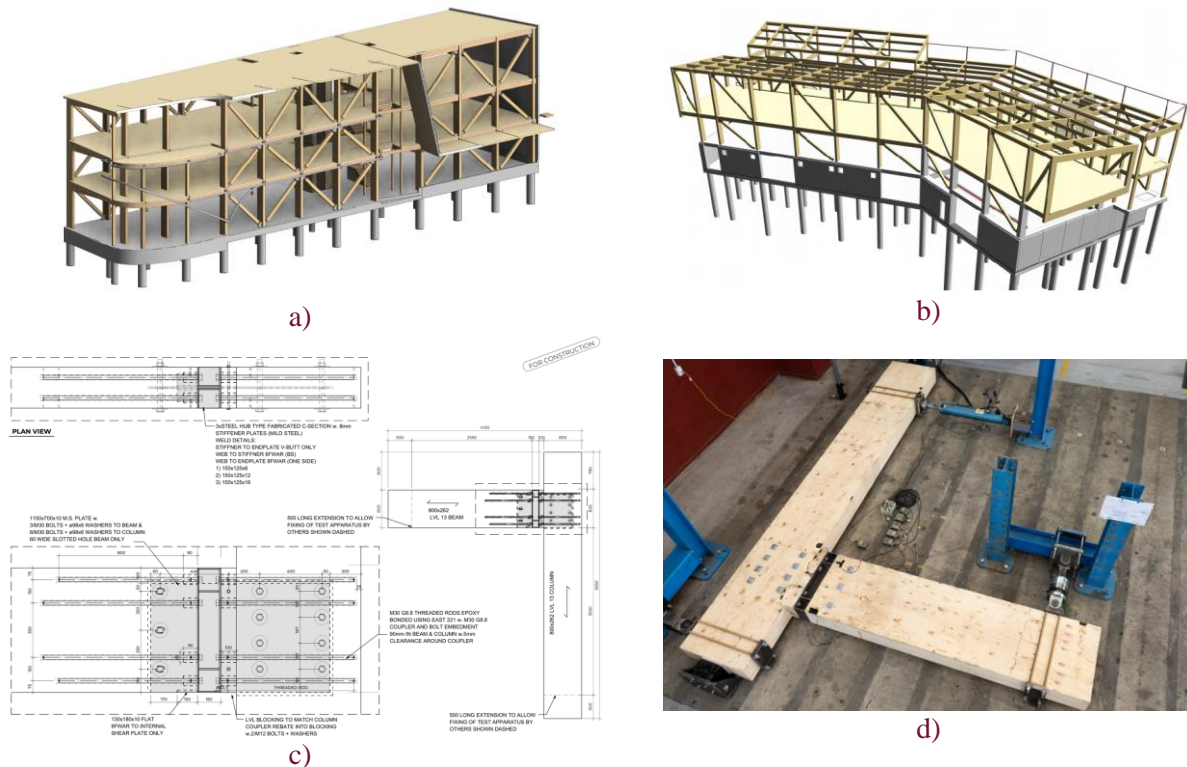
External Beam-Column Joint Hub Connection: a) Arawa Street Project, b) Otago Polytechnic Trades Training Centre Project, c) Test Specimen (c.o. Red Stag Timberlab), and d) Test set-up
